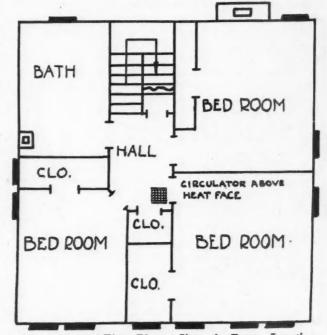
Second Floor Plan to Show the Proper Location of a Second Floor Register, or Circulator, in a Pipeless Heating System.
